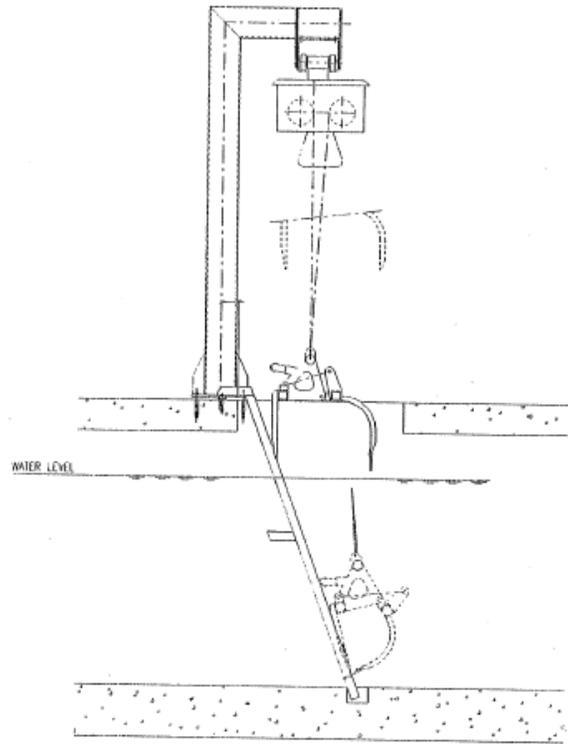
Typical Brackett Bosker Raking Machine sectional view.
